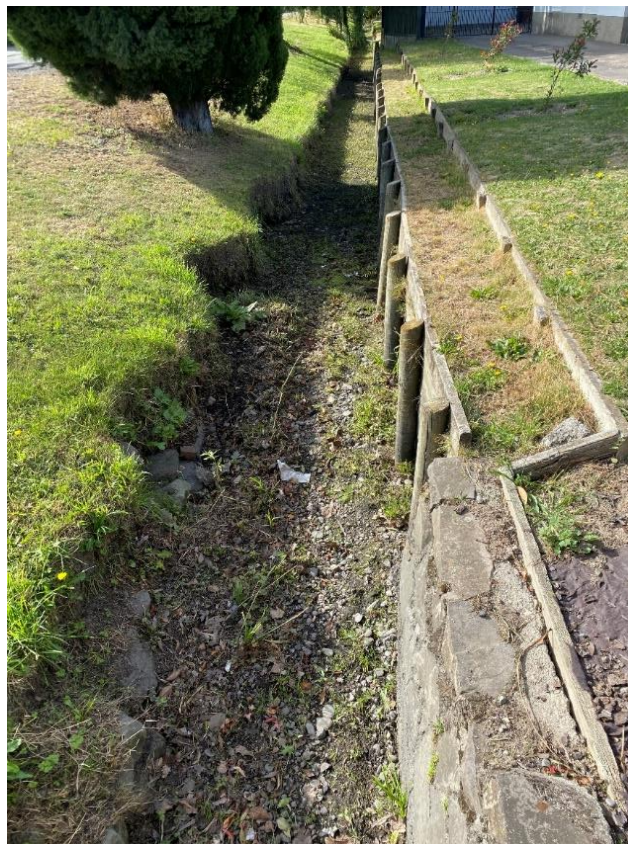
Photo looking downstream of Dudley Creek, standing next to Greers Road.
